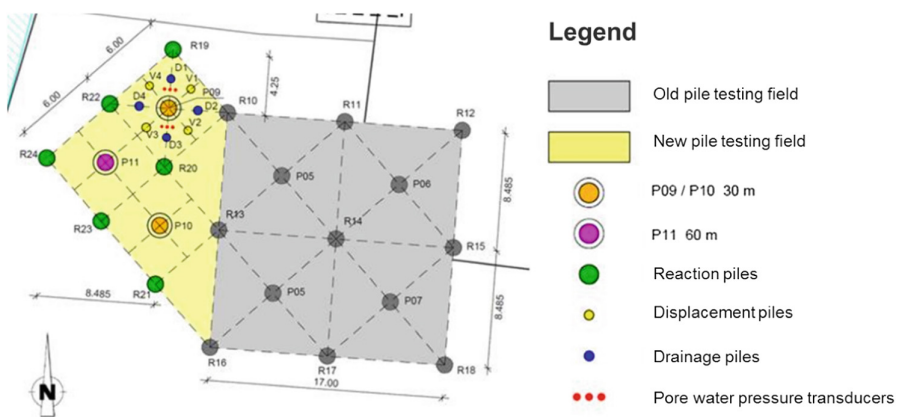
Third static pile testing campaign – Test field and pile layout, including the reaction piles.
